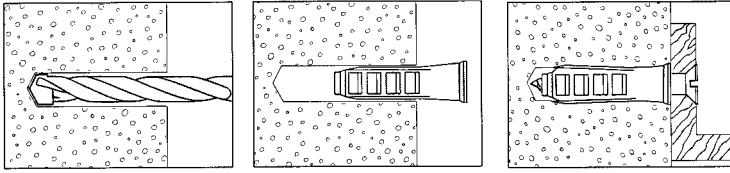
shows an anchor for autoclaved aerated concrete consisting of a sleeve with helical ribs plus a screw. The anchor is hammered into a cylindrical hole (drilled without hammer action) whose diameter matches that of the cylindrical anchor shank. The sleeve is subsequently expanded by installing the screw (Fig. 2.52). The ribs serve to prevent the sleeve from turning as it expands as well as to distribute the load over a larger area of the substrate.
